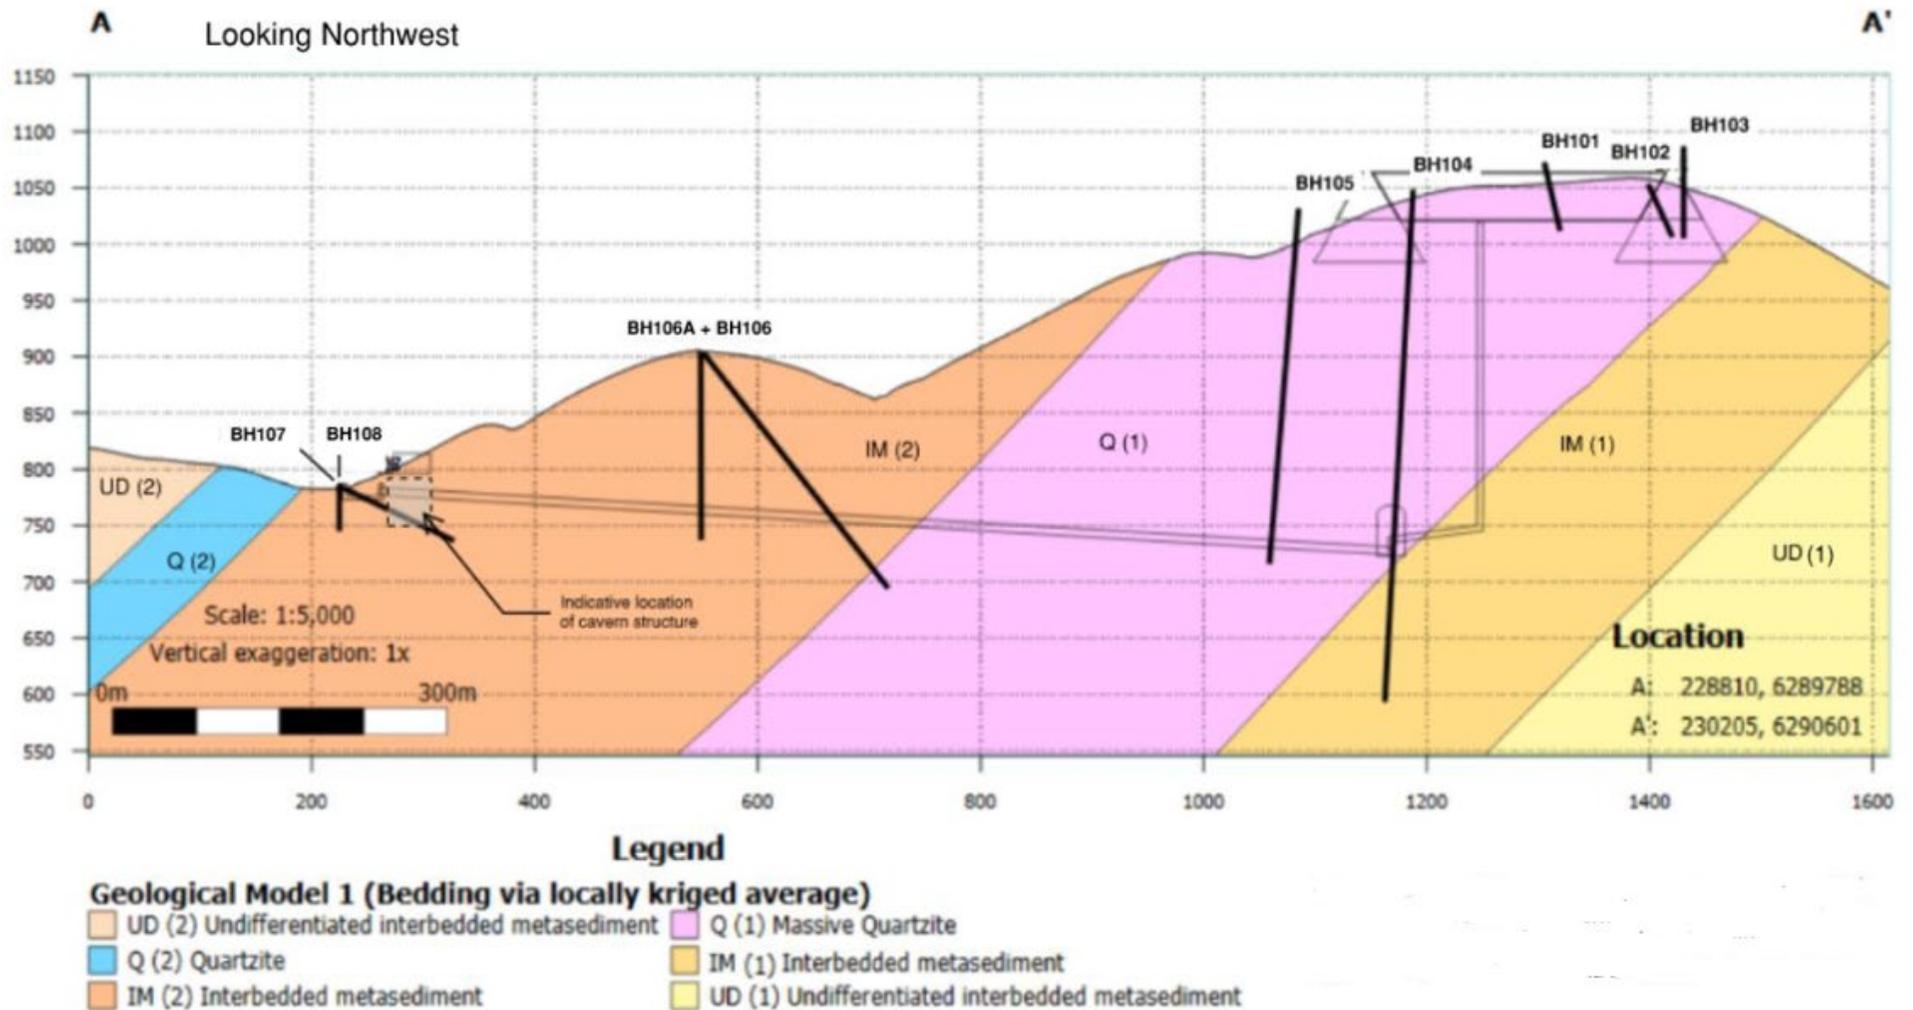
Schematic cross-section with proposed borehole locations and targeted geology (source: Arup 2021)
